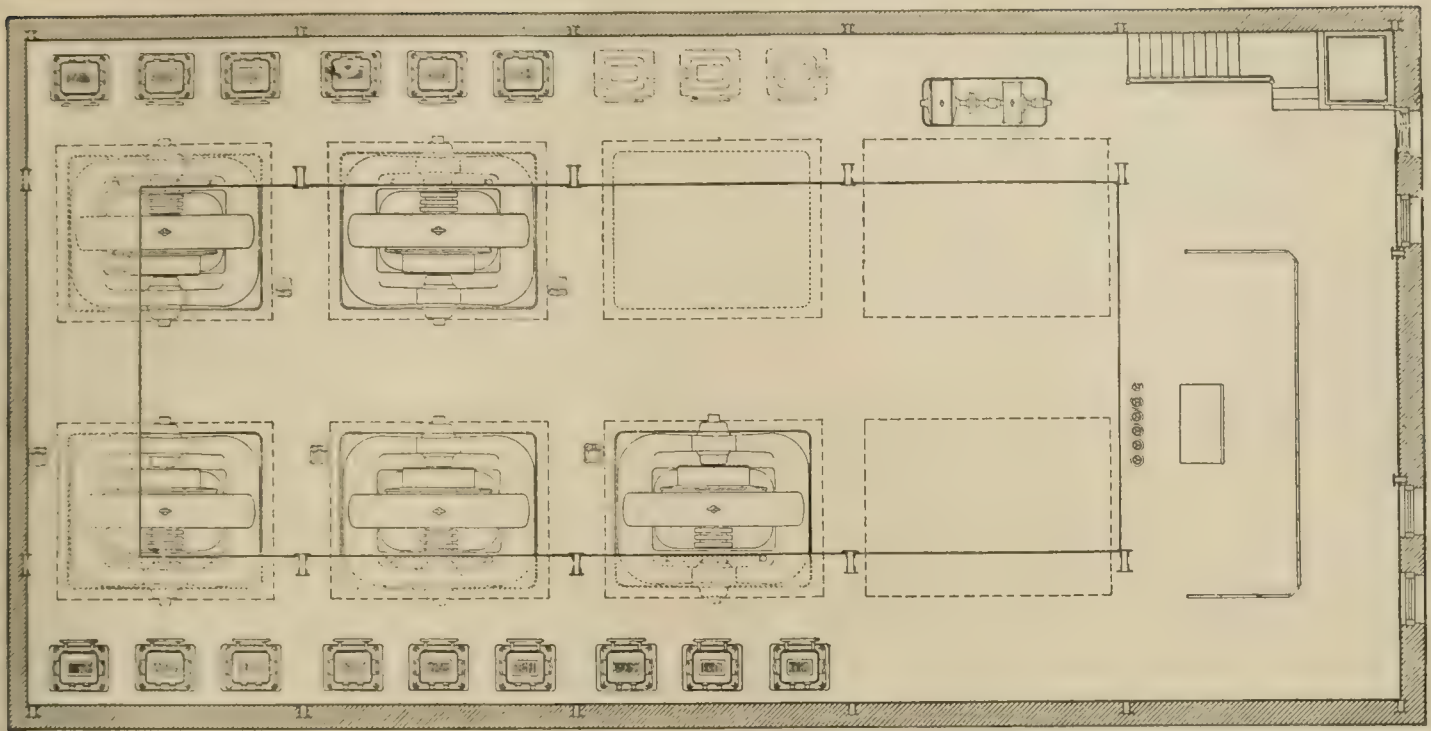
PLAN OF SUBSTATION, MANHATTAN RAILWAY. CAPACITY, 12,000 KW.
